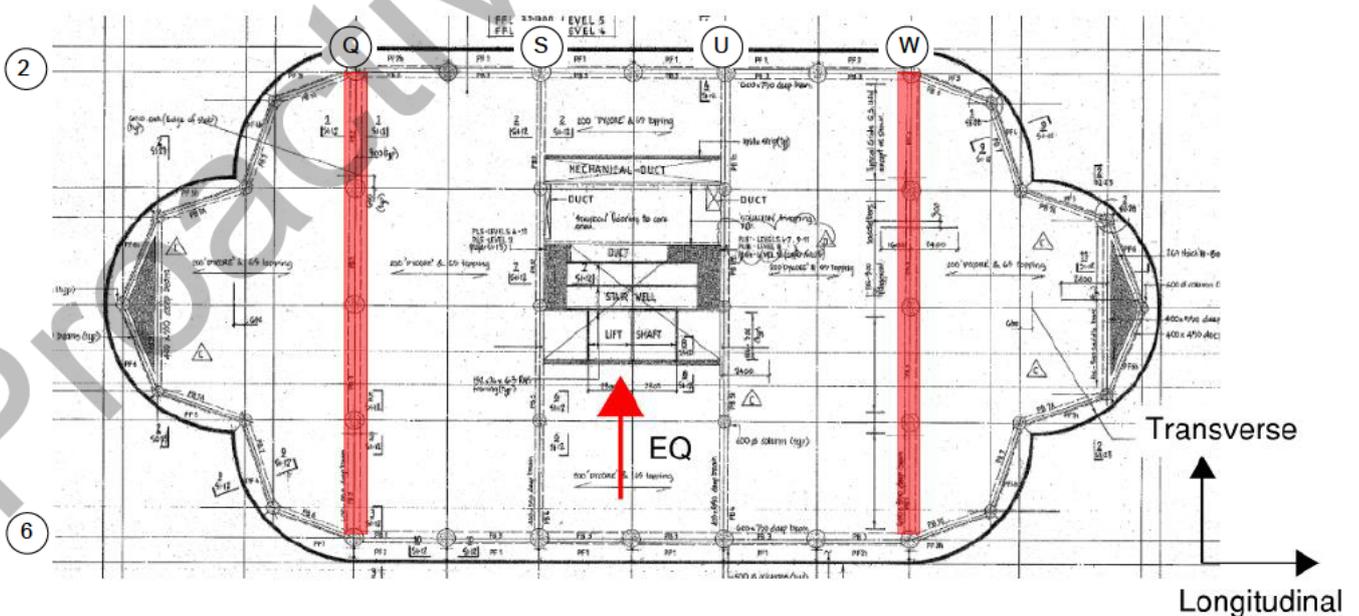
Plan view: Transverse primary lateral resisting elements
